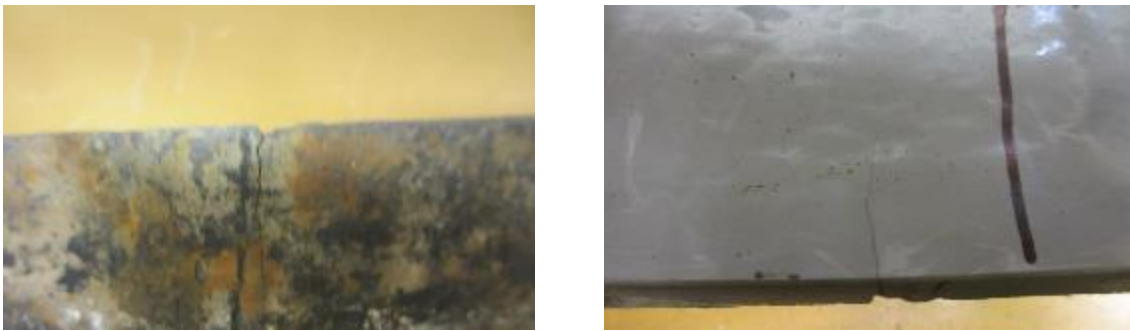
Pipe Wall Assessment using PICA I-Pit Tool.
